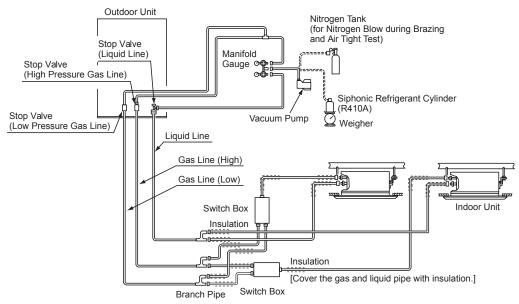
Vacuum Pumping and Refrigerant Charge
